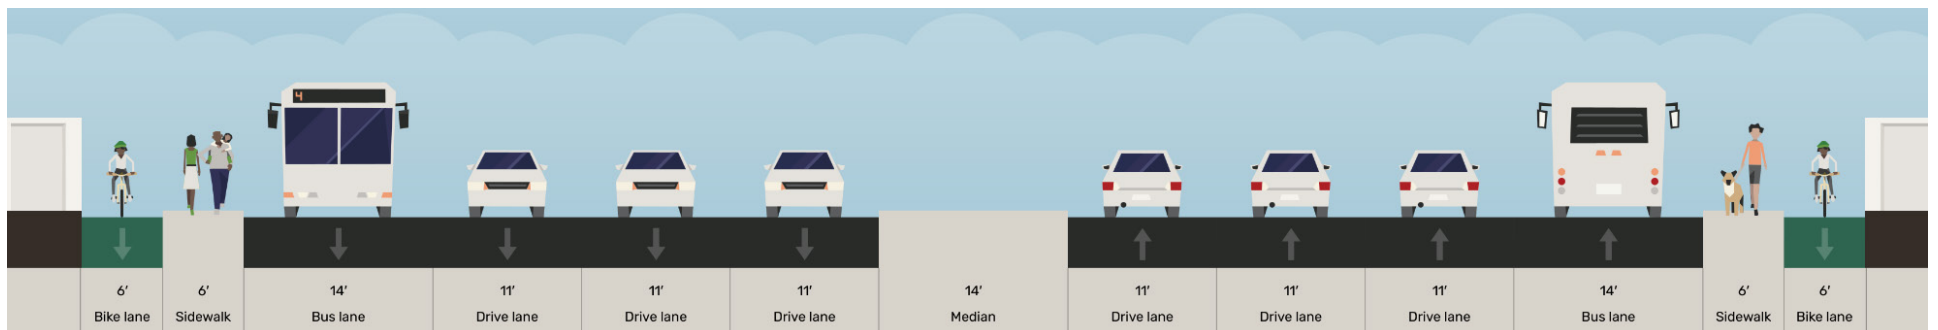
Proposed cross-section: Crenshaw Blvd from W 118th Pl to I-105 eastbound on-ramp (at I-105 Underpass)
